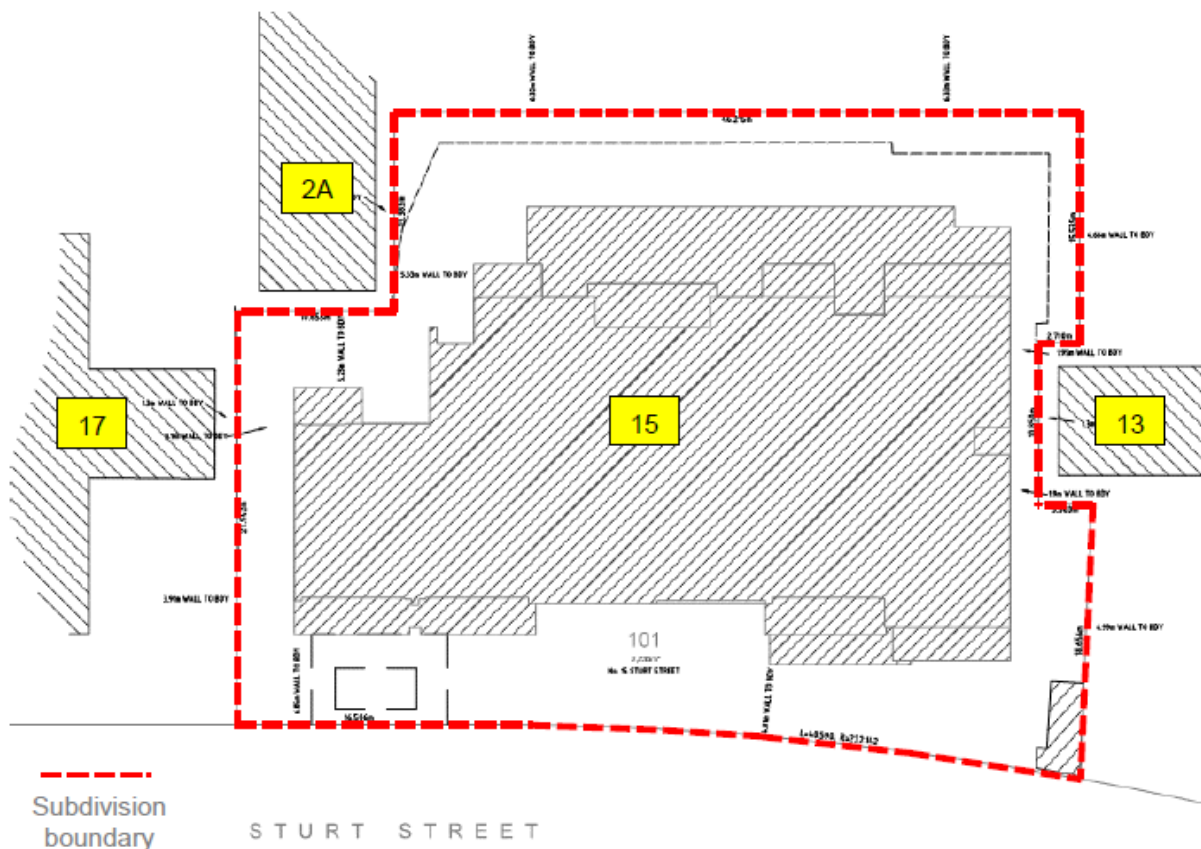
Site Plan with Proposed Sub-Division Boundaries
